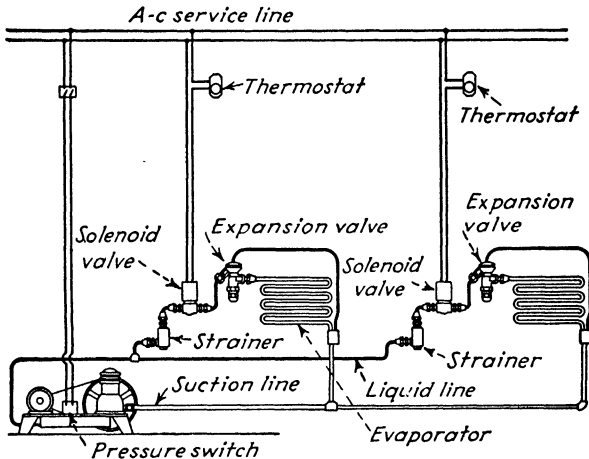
Superheat of suction gas regulates liquid flow to cooler after thermostat opens solenoid valve. (Courtesy of Detroit Lubricator Co.)
